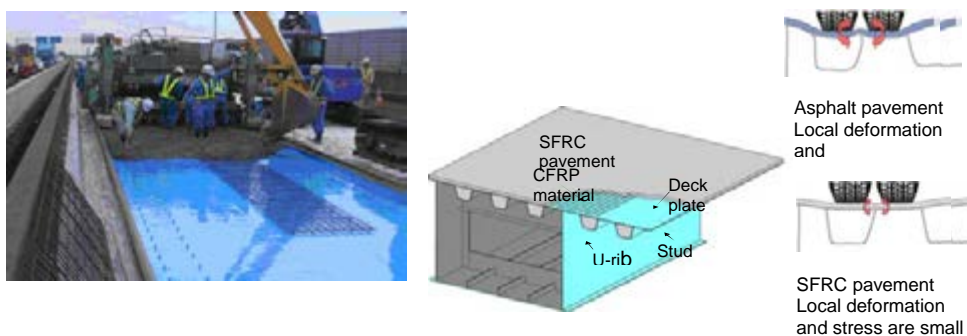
Fatigue durability improvement technology of existing steel floor slab using steel fiber reinforcement concrete (SFRC)
